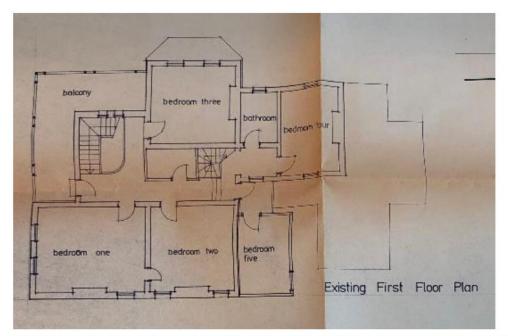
Existing First Floor plan associated with BA 100-88 supplied by architect Bryan Purkis (Source: Burwood Council archives).
